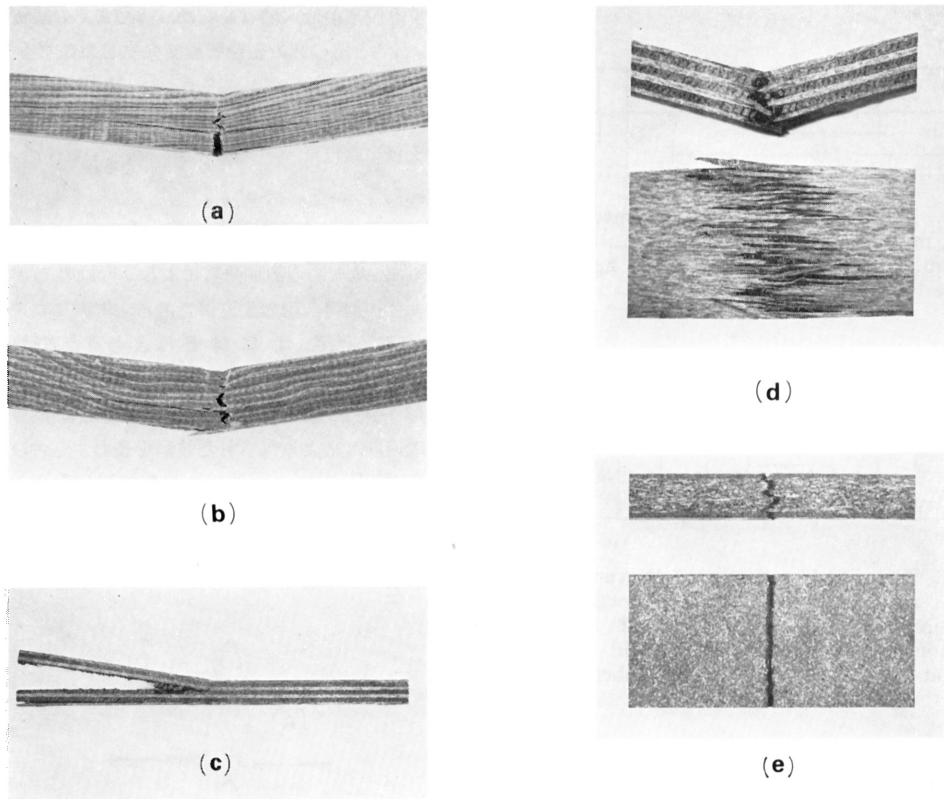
Fracture types of test specimens in impact fatigue tests.
